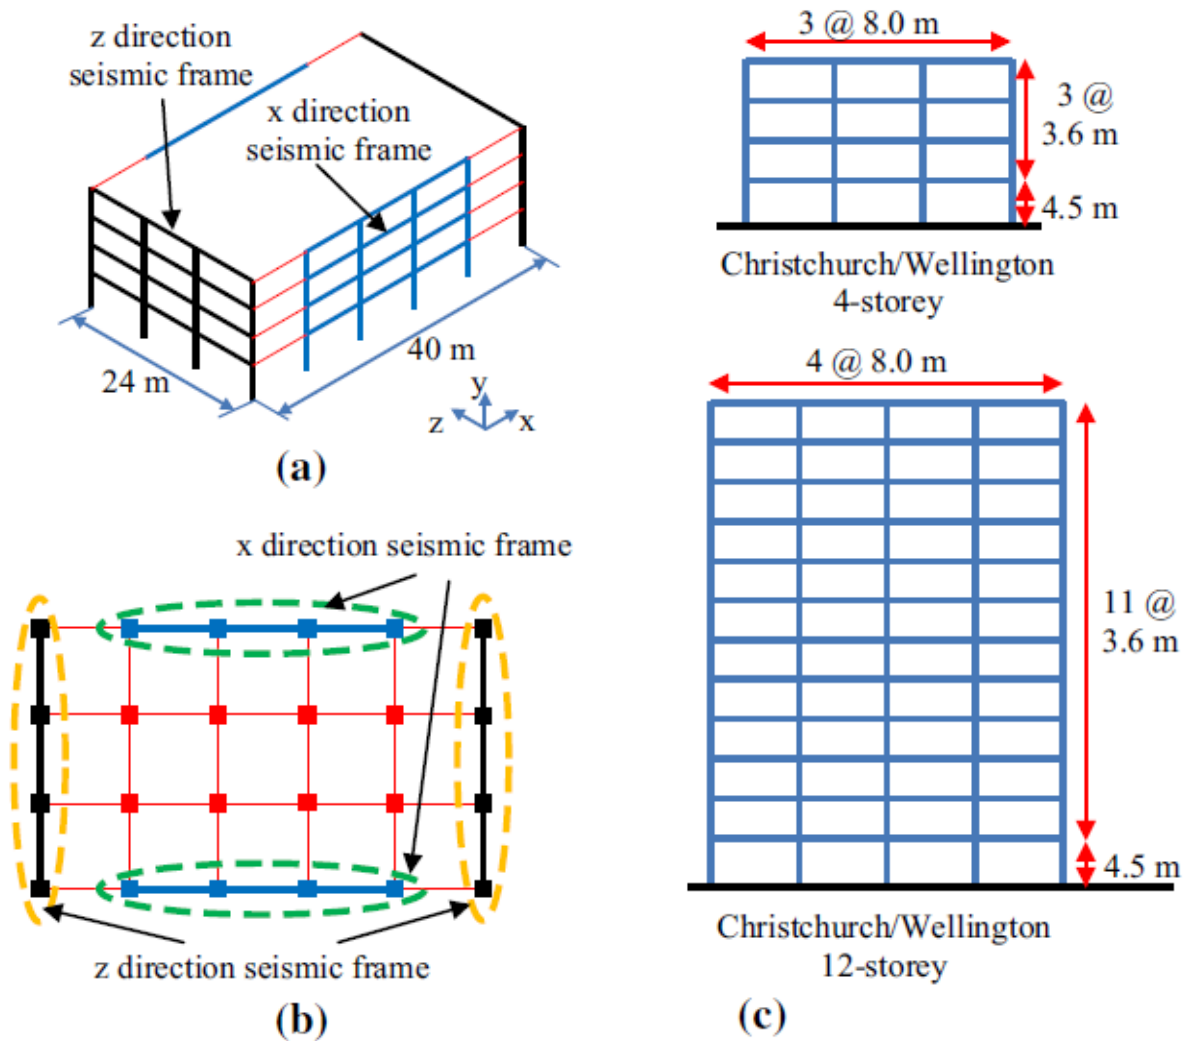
Case study building; (a) example of 4-storey isometric view, (b) example of plan view, and (c) frame elevations (Yeow *et al.* 2018).
